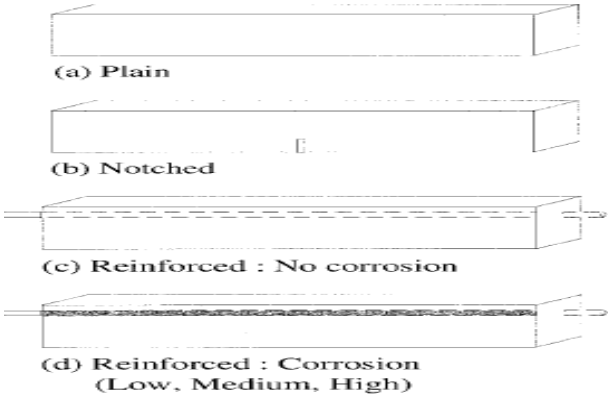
Types of concrete beam specimens (Yoon et al., 2000)
